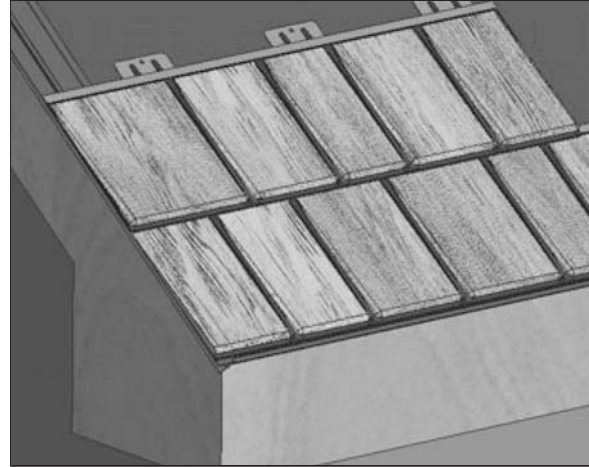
Roof Corner Showing Cutoff Panels
